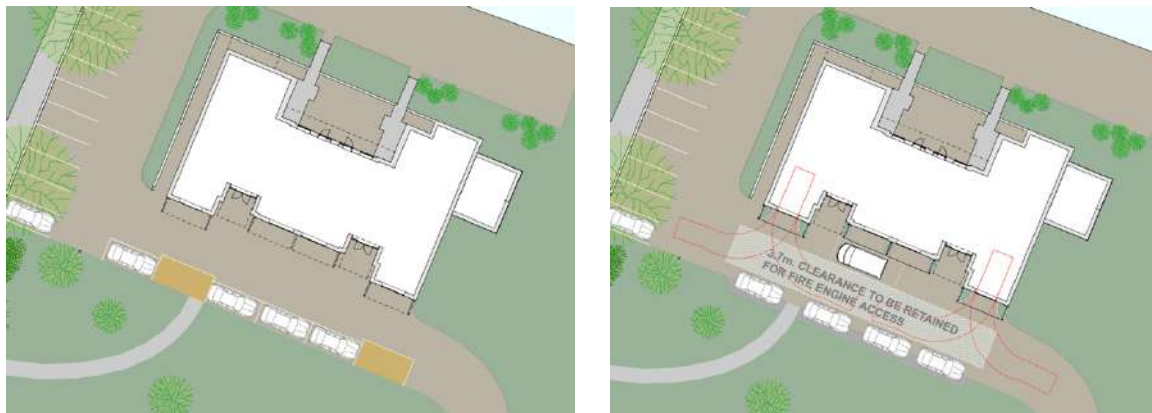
Existing (left) and proposed (right) plans of the front parking area
